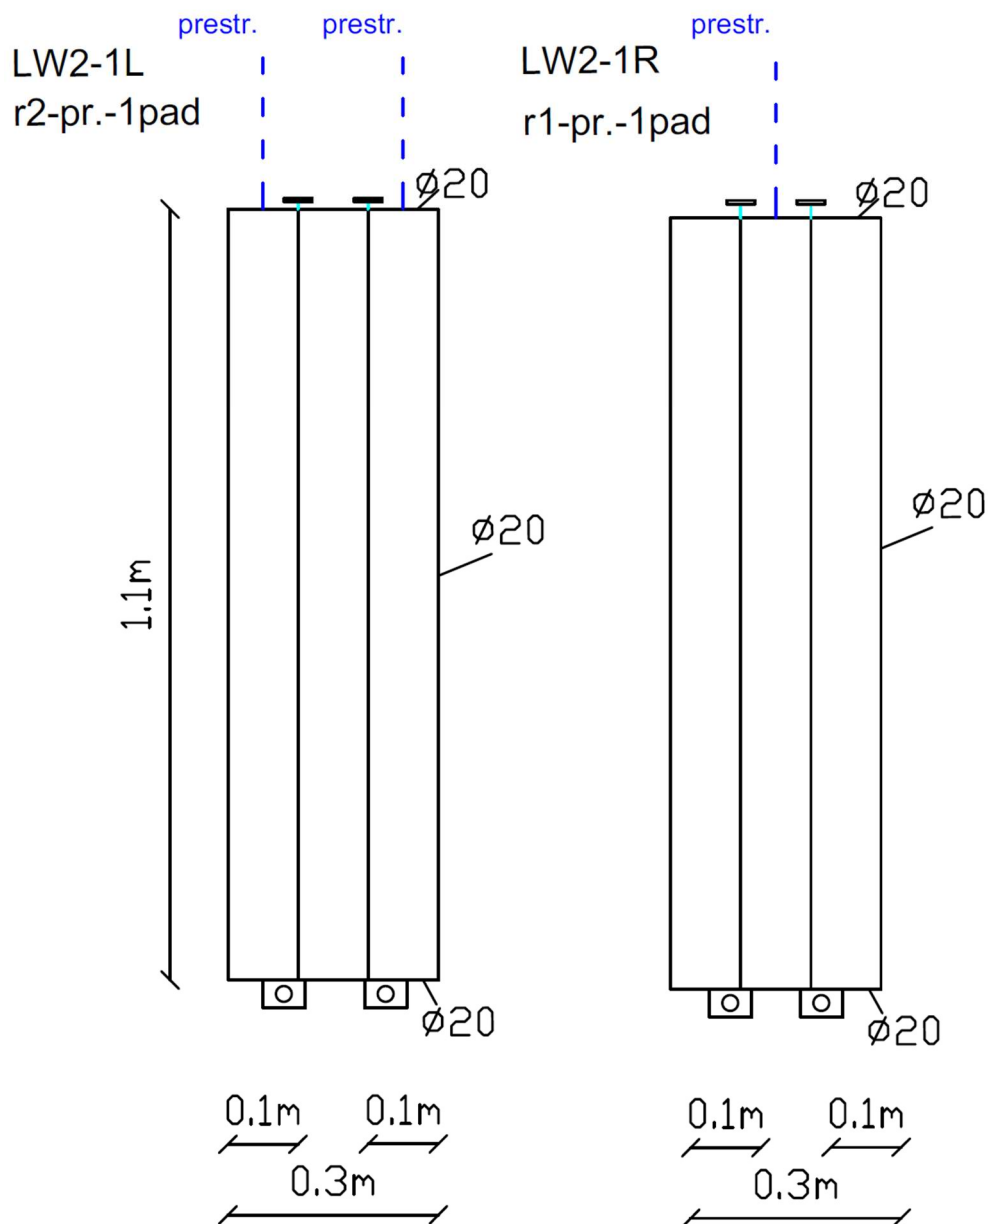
Living wall 2-1 left side and living wall 2-1 right side
